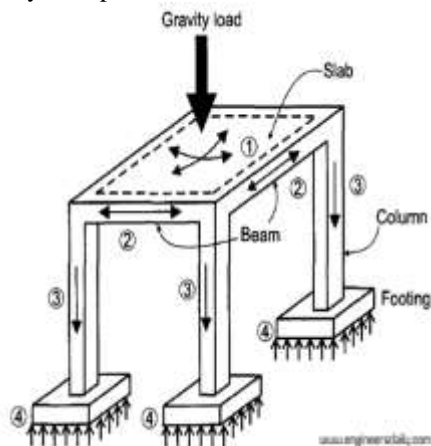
An isometric view of a concrete structure showing a gravity load path
